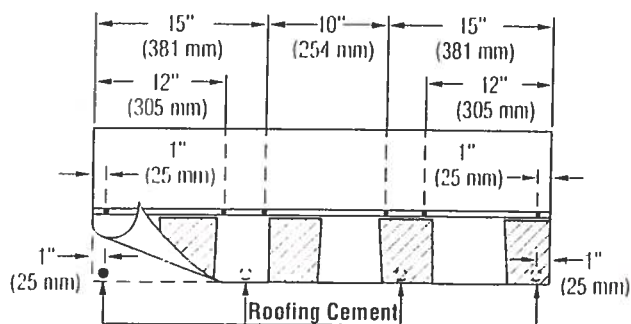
Use six nails and four spots of asphalt roofing cement on steep slopes.
